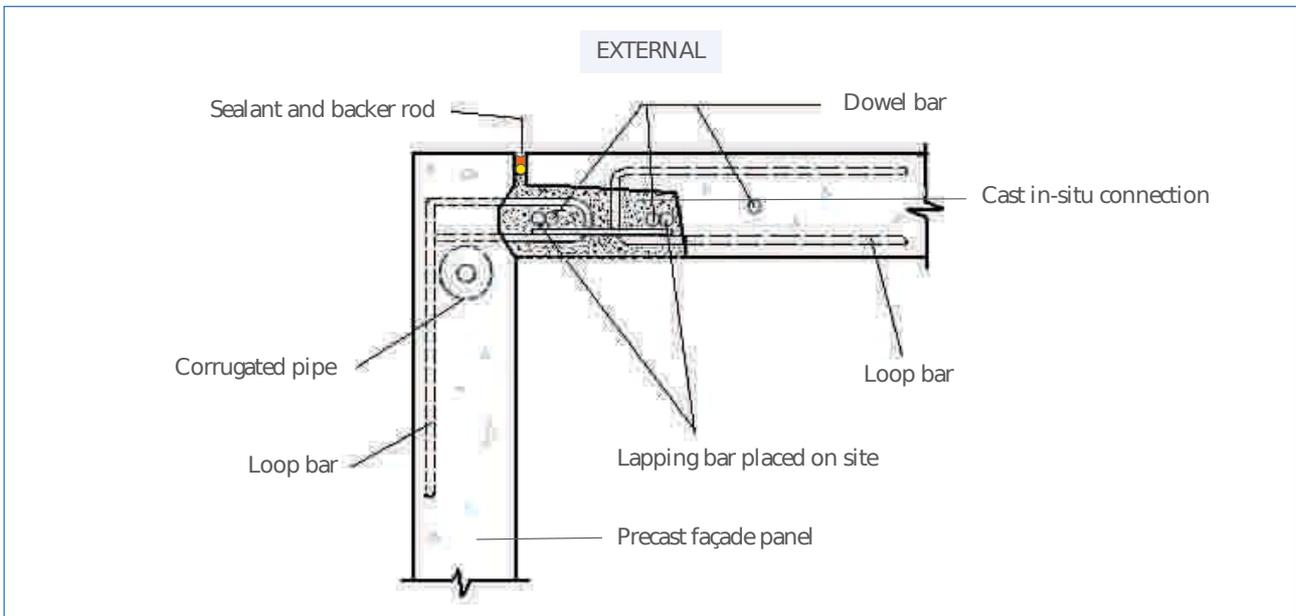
Typical details for corner joint between precast panels (plan view)
